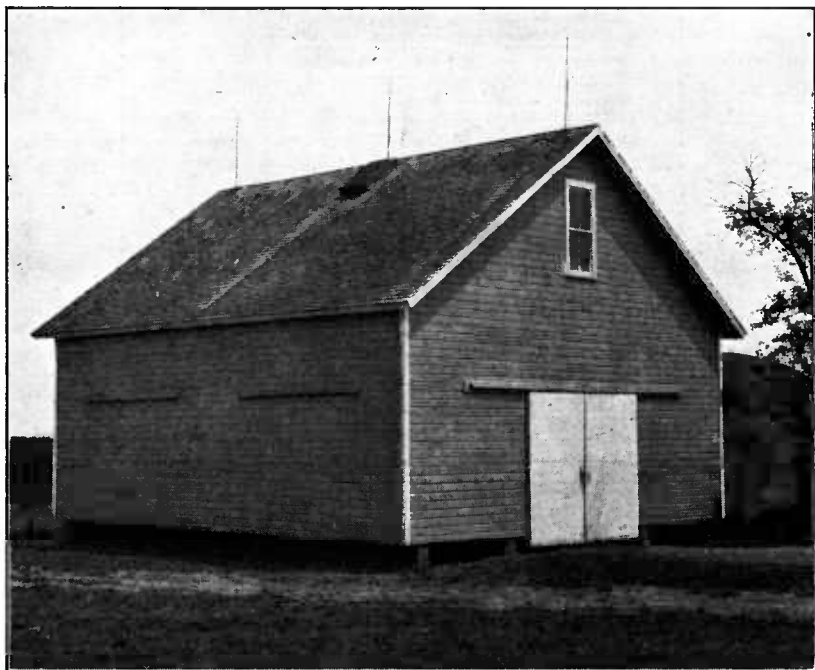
An excellent farm granary, 30 by 32 feet, of 7,000 bushels capacity set on good 10-inch concrete walls with 16-inch footings. The sills are 18 inches above grade, allowing good air circulation, which is conducive to long life of timbers, and affording no harborage for rats. The building is well braced and tied together. It is filled by means of a portable elevator
